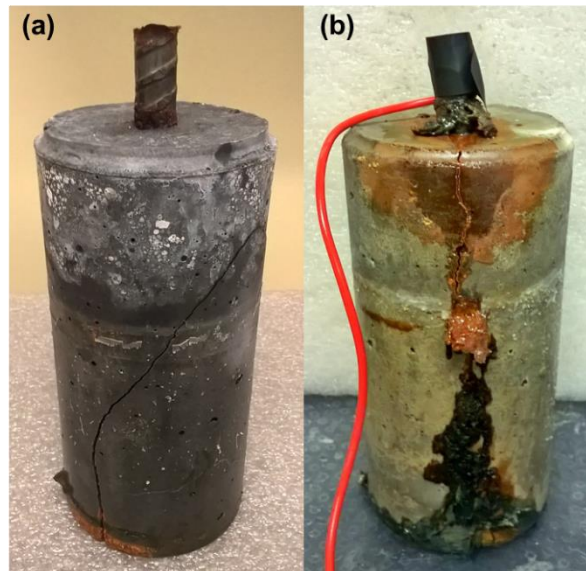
Corrosion crack on (a) UHPC and (b) control concrete specimen
